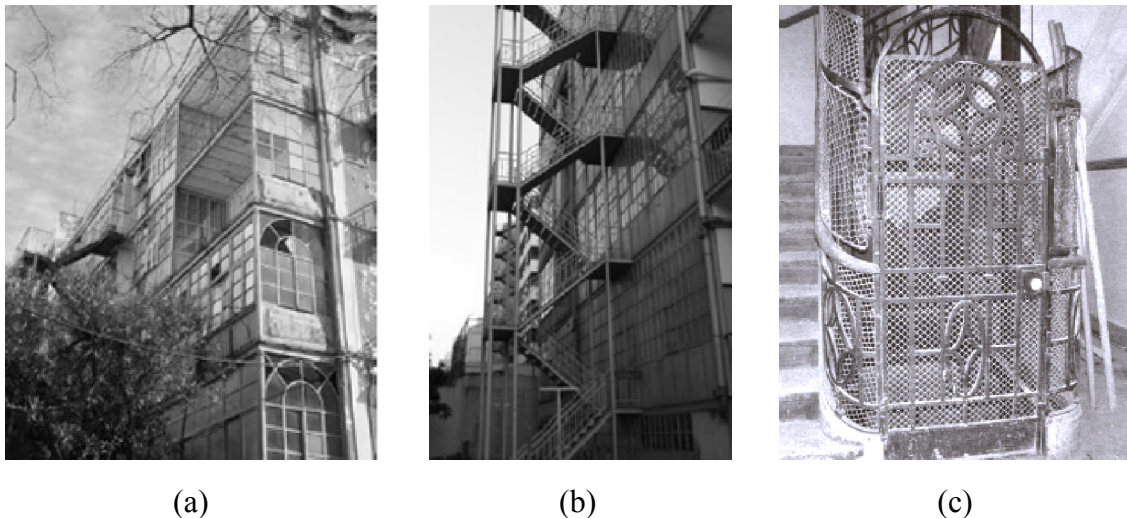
Elements of the “gaioleiro” buildings: (a) sunrooms; (b) external stairs (Andrade 2011); (c) lift.
